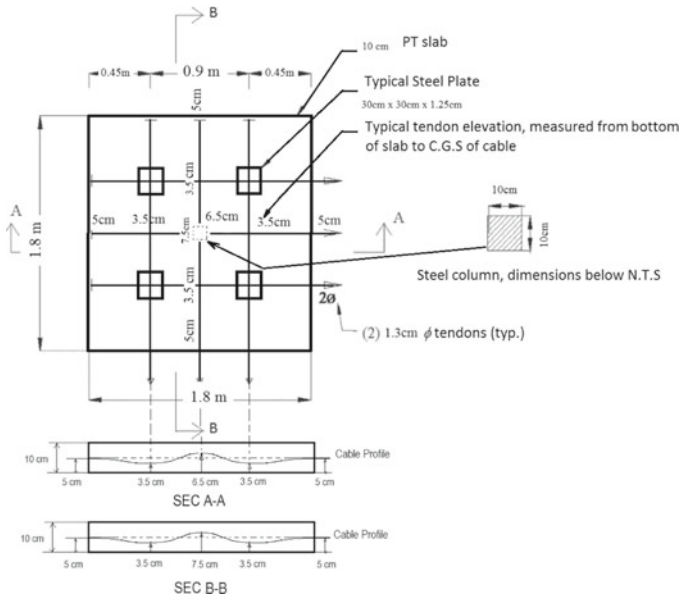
Unbonded PT Tendon layout in PT slab [7]
